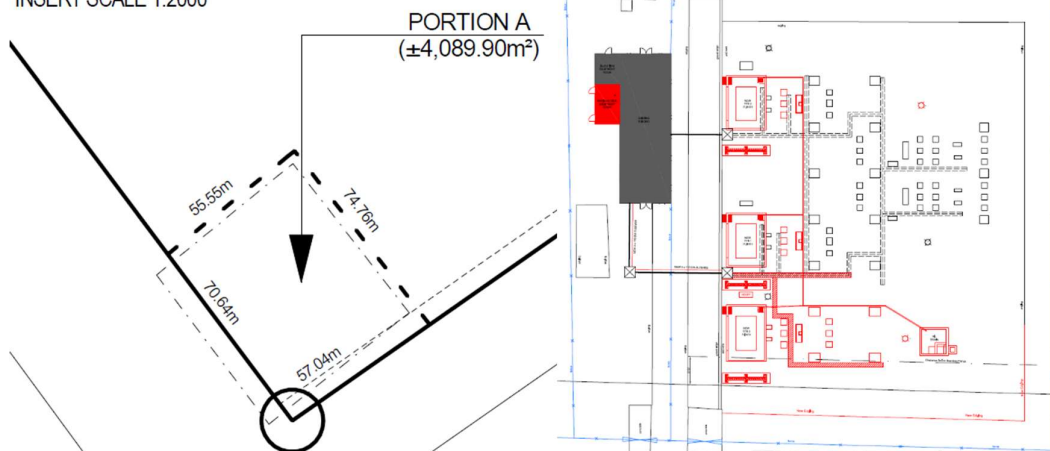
Subdivision Plan and Site Layout showing intended upgrades
